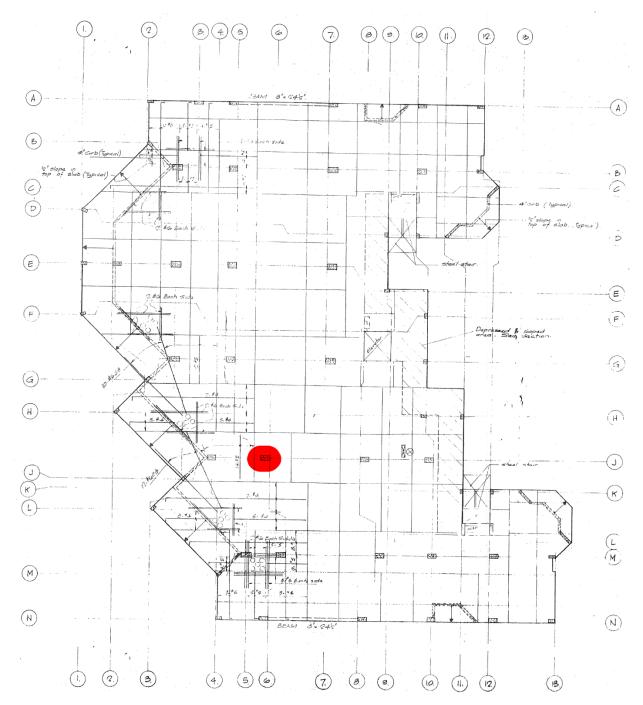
Foundation/column line overstressed at SDL of 20 psf.
